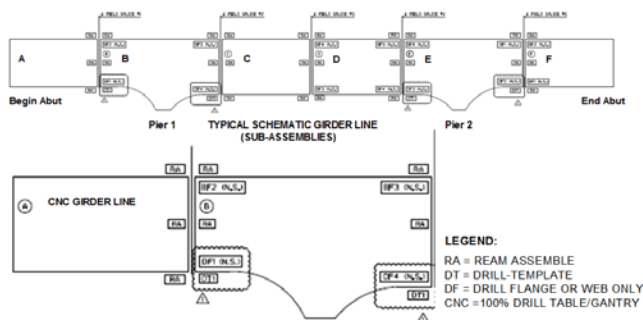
Schematic Girder Elevation. Girder Fabrication Methods Utilized For Field Sections.
